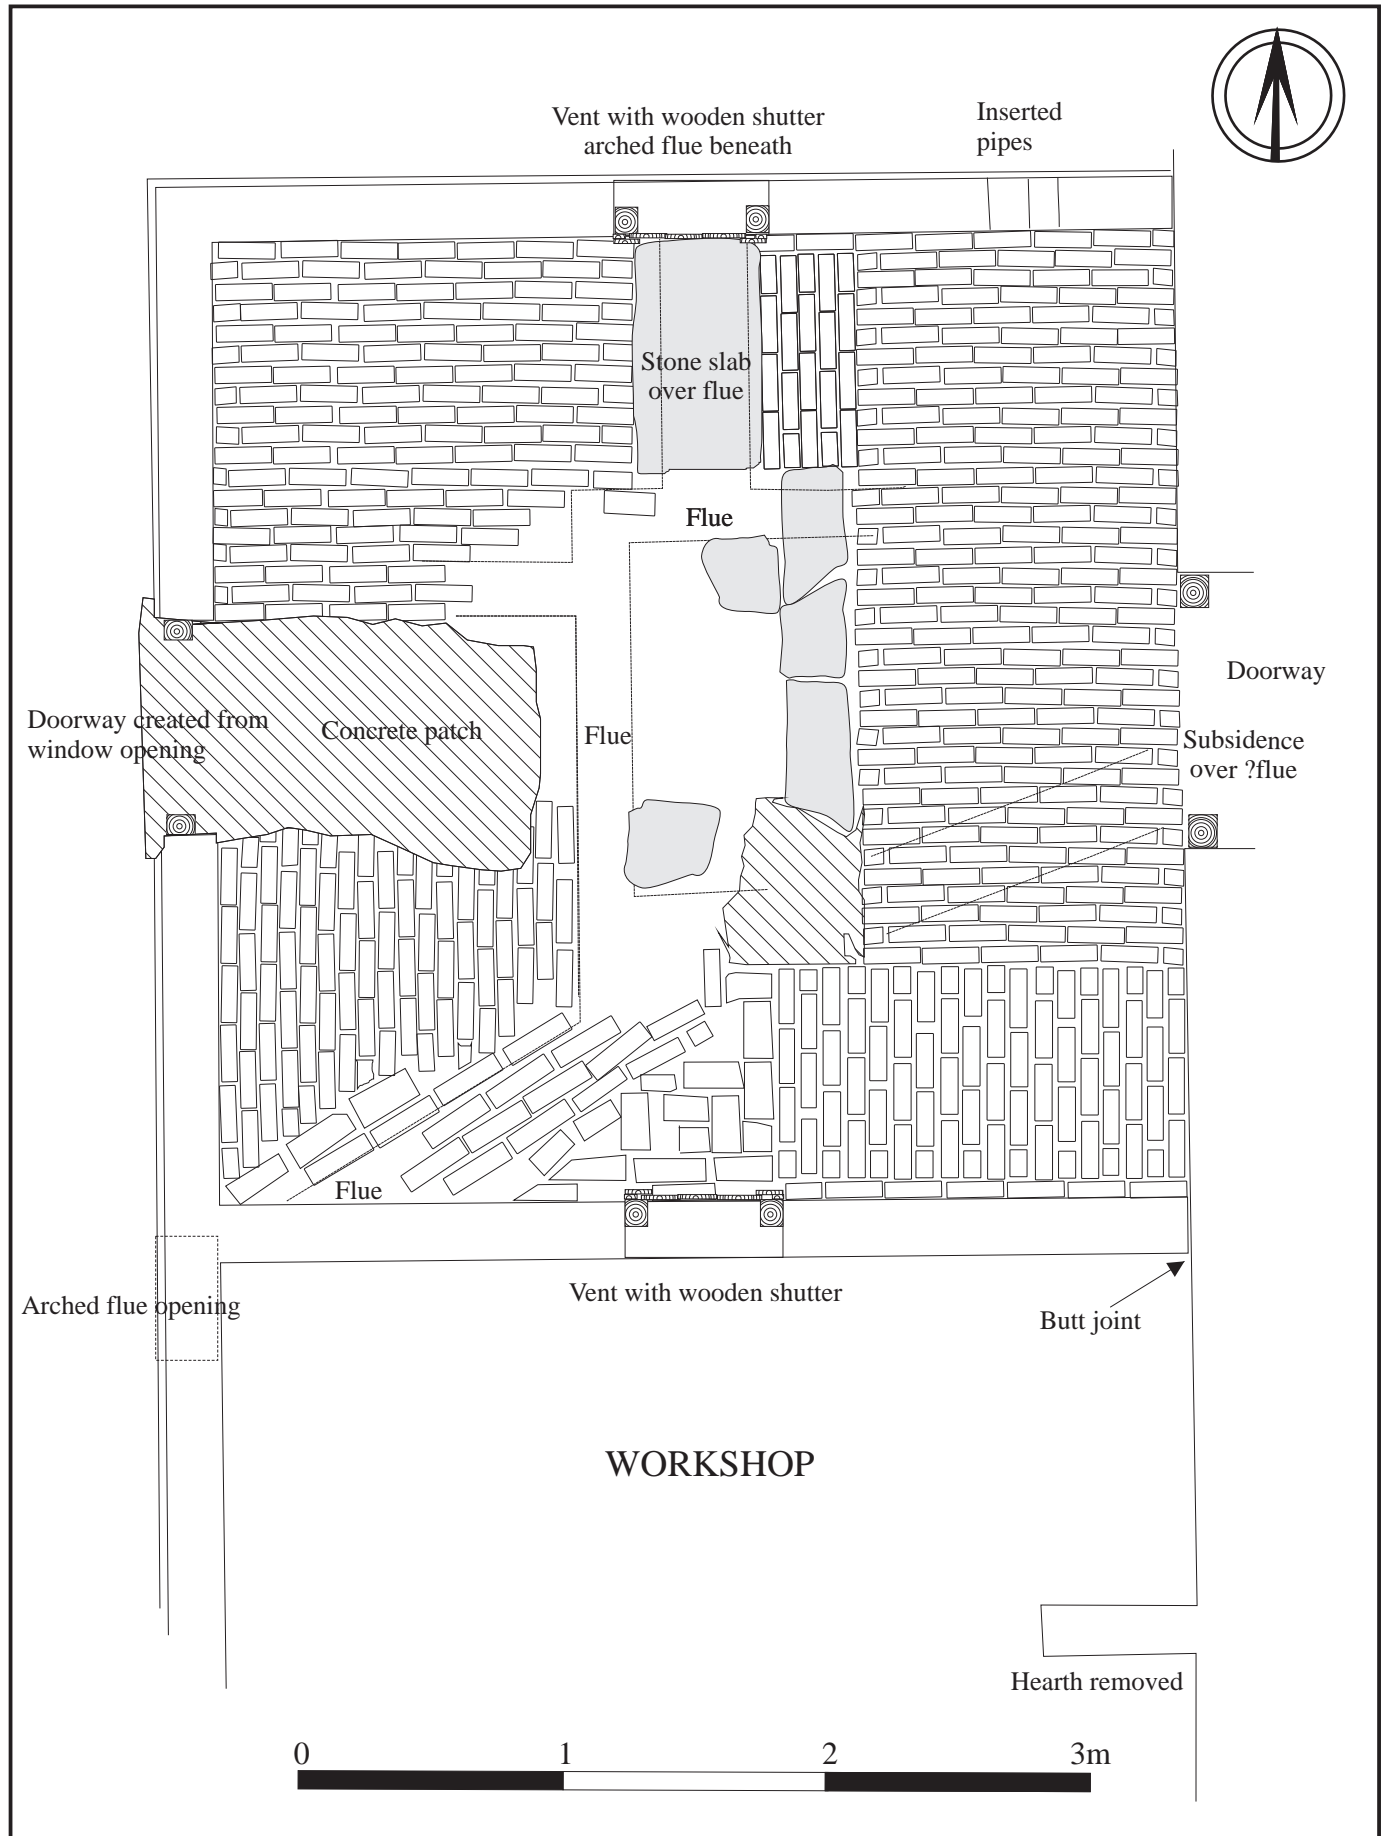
Detail plan of hop-kiln floor (nb some flues partially collapsed and patched, central slabs missing)
